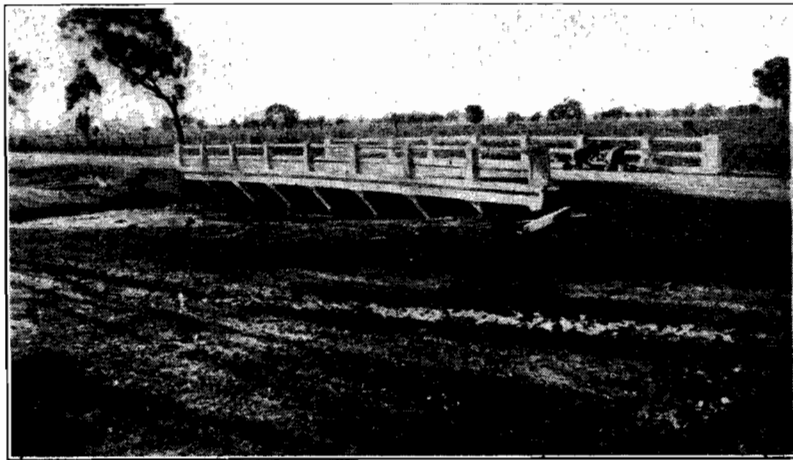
Widened bridge on the Hume Highway between Benalla and Winton.
